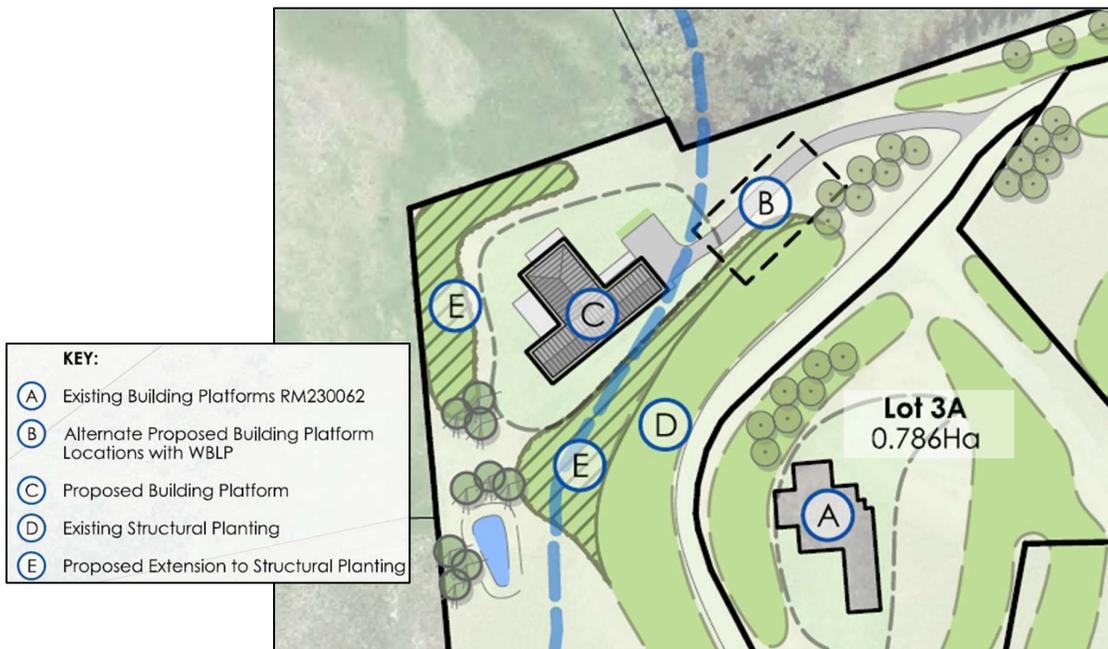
Snip of proposed landscape plan showing the further mounding that is proposed in addition to that consented and formed through RM230062.
